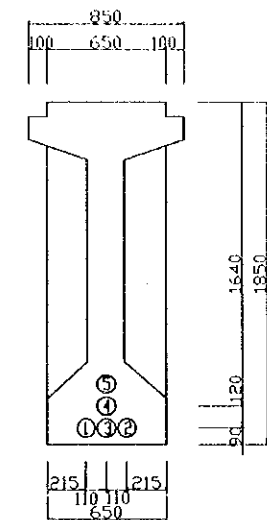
# DETAIL OF SUPERSTRUCTURE FOR TRA ON BRIDGE (Ls=36.0M)
